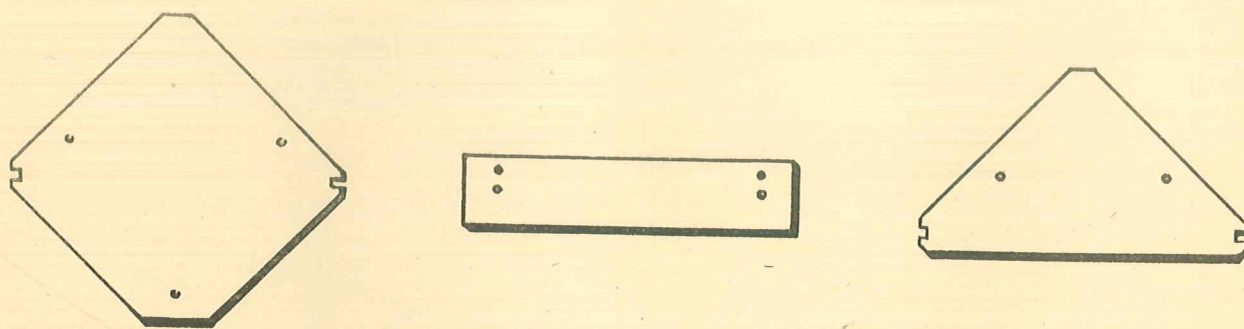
Pieces required for laying a roof by hexagonal method—main body shingle, eaves starter, eaves shingle
